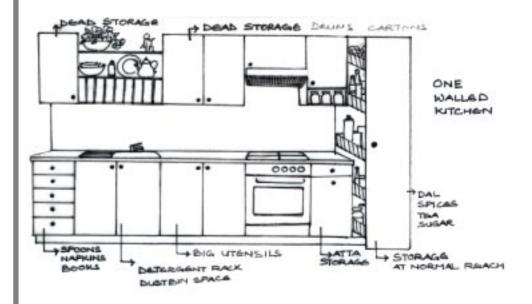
Elevation plan of a standing kitchen showing various storage arrangements
